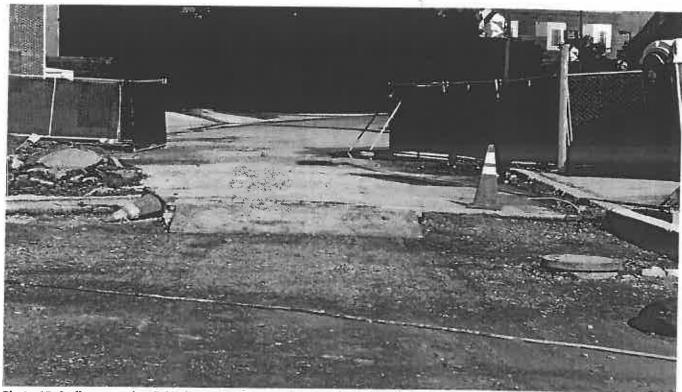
Sediment and Debris placed NW of the site on Cole Fieldhouse Drive.
